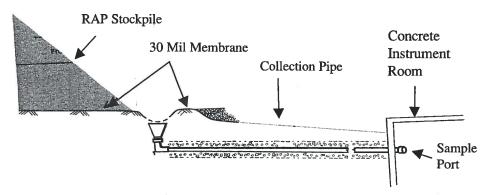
Site Layout of Experimental RAP Pile (Sadecki et al., 1996)
